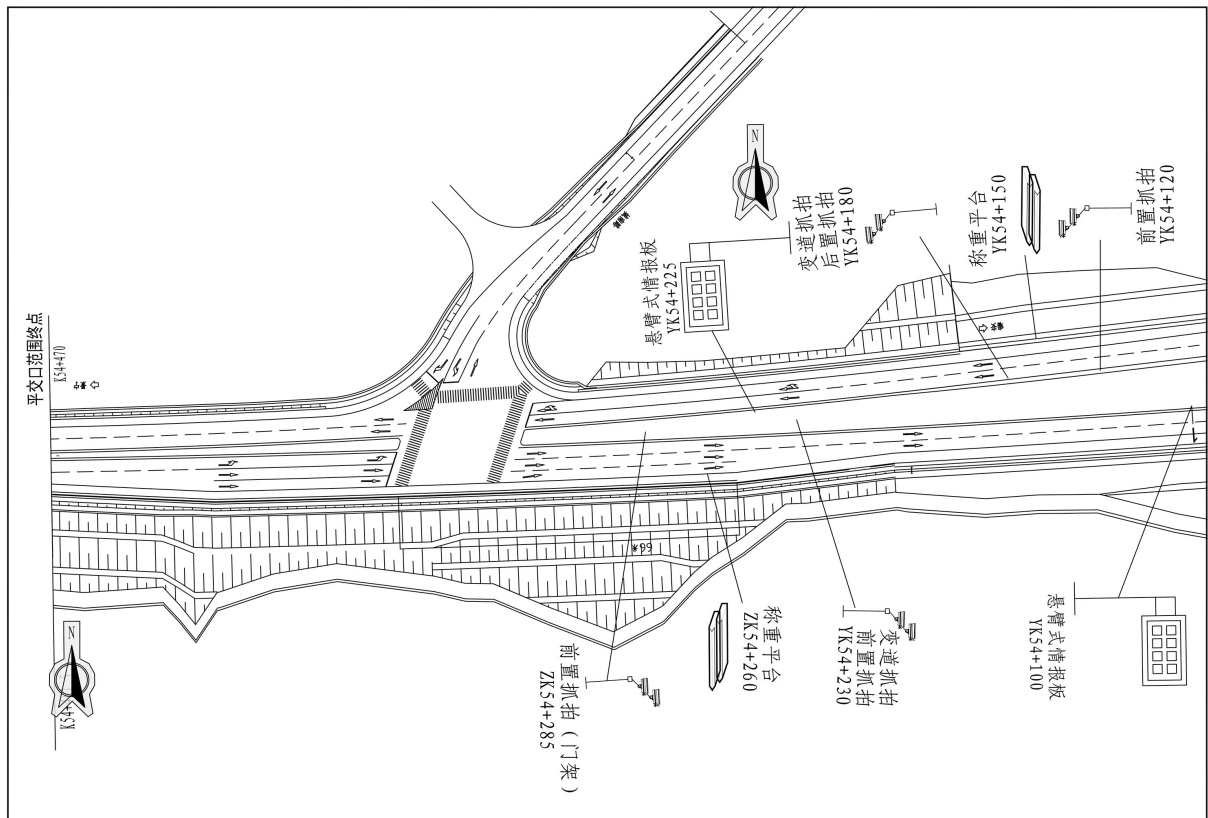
Diagram of the off-site law enforcement point at the tunnel mouth
